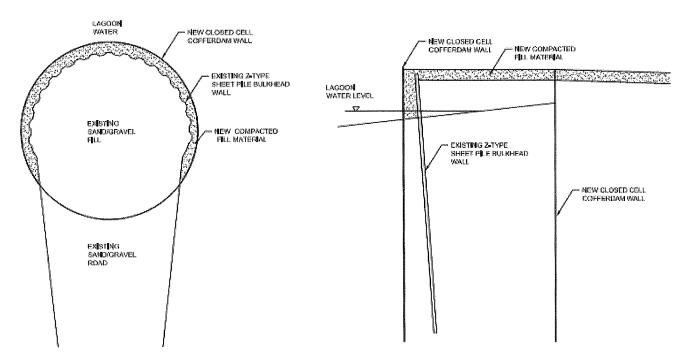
Closed cell cofferdam wall conceptual sketch. Not to scale & not for construction.
